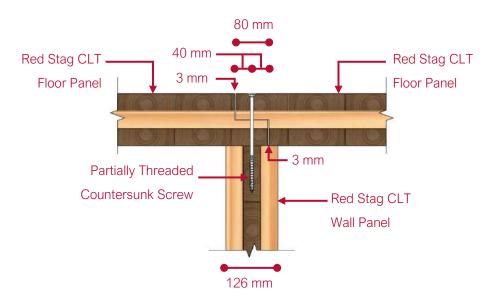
Red Stag three (3) Layer CLT wall panel to CLT floor panel half joint connection.
